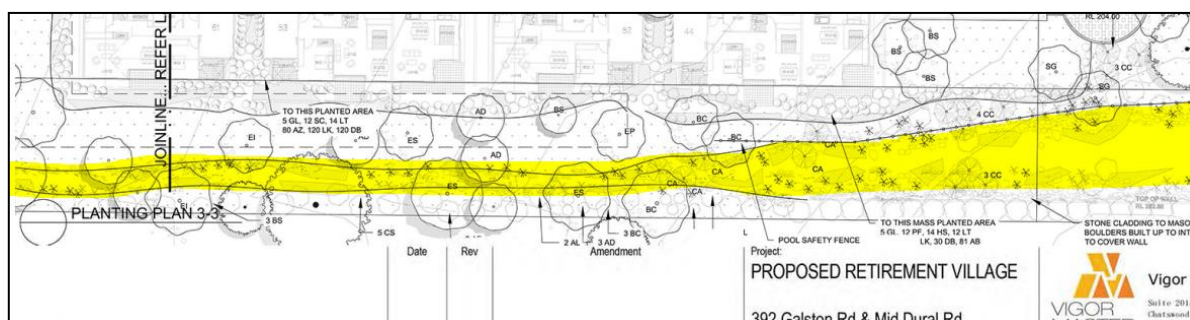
Approved Landscape plan. Drainage swale highlighted in yellow for clarity
